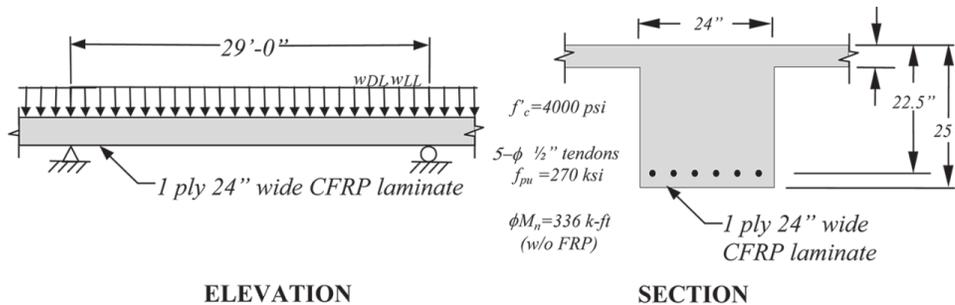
Schematic of the idealized continuous prestressed beam with FRP external reinforcement.
